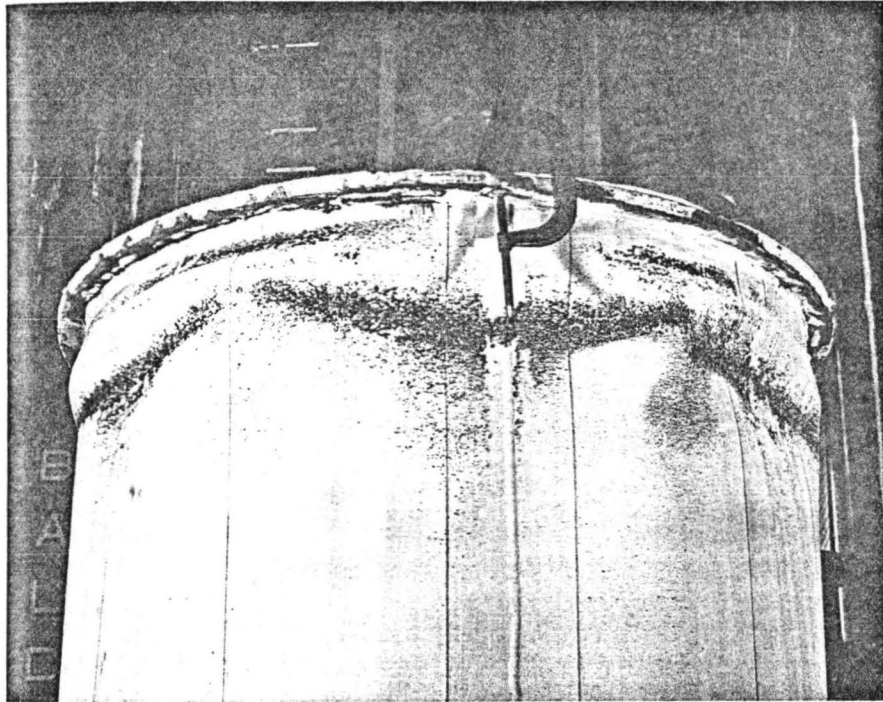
Steel Ring welded to the top end of Specimen P6
